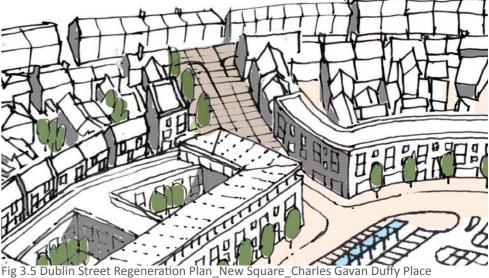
Dublin Street Regeneration Plan_New Square_Charles Gavan Duffy Place
